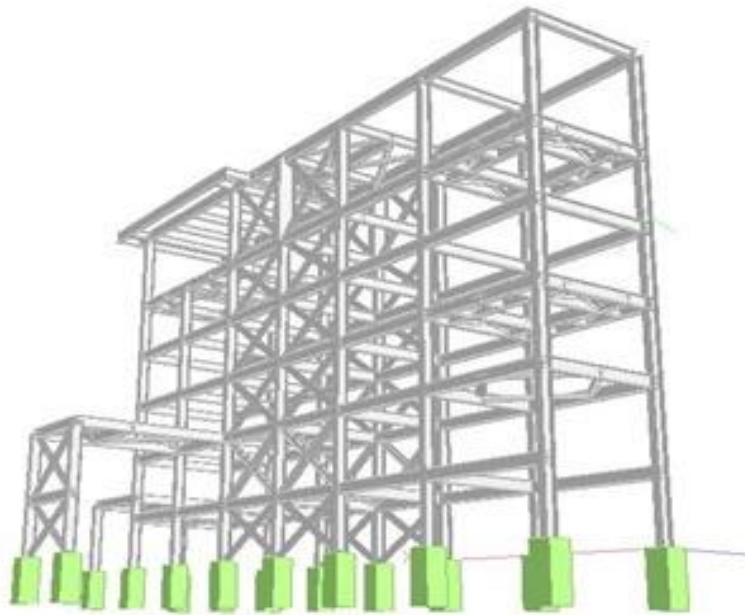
Structure connected with Hinge joints (<https://theconstructor.org/structural-engg/methods-of-steel-structure>).
